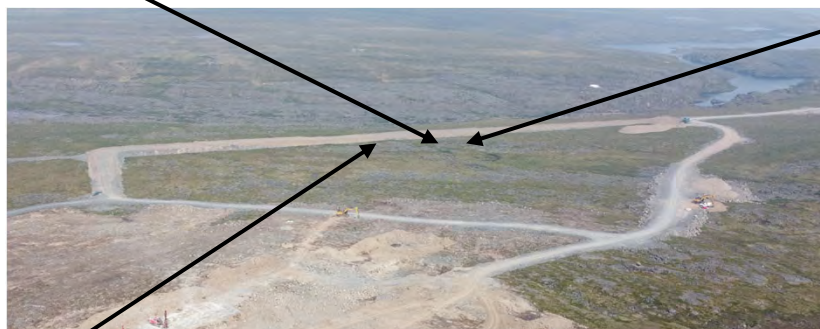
Note cracks on roadway, road fill ~4 m above tundra
